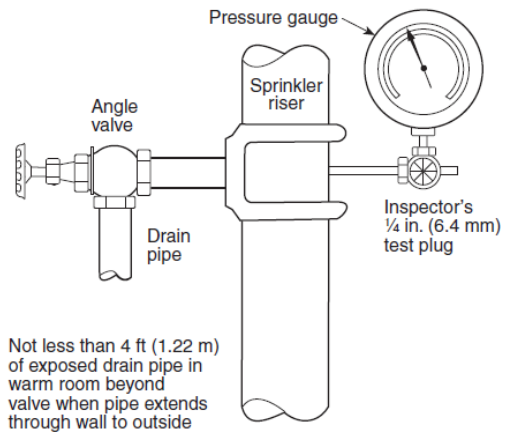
(b) Drain Connection for System Riser.
